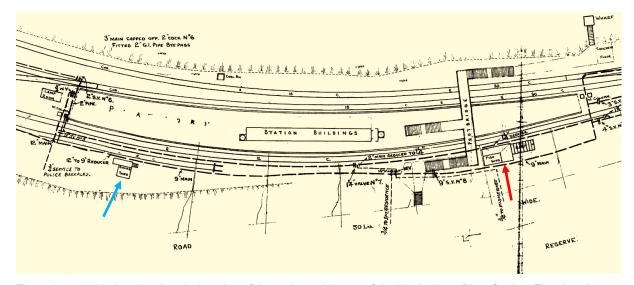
c.1920 plan showing the location of the series and layout of the Hawkesbury River Station. The plan shows the location of the "Fish Shed" (red arrow) and Goods Shed (blue arrow) located close to the station layout (Source Sydney Digital Plan Room EDMS CV0068765).
